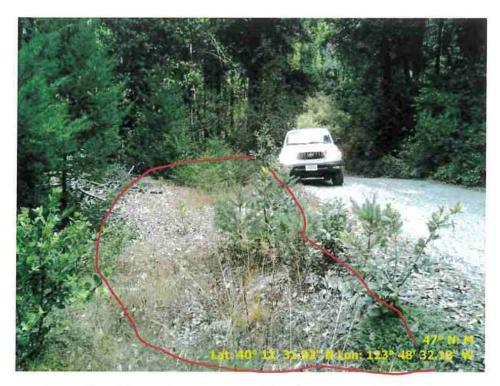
Photo of Road Point 110 showing a pullout that needs to be cleared of vegetation and regrading.
